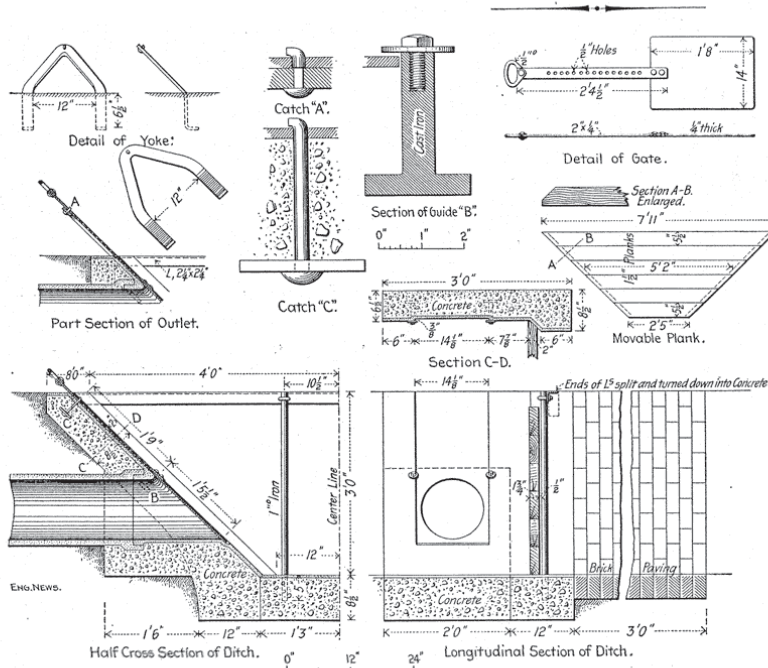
DETAILS OF CULVERTS BETWEEN THE DITCHES ON SEWAGE FARM.
